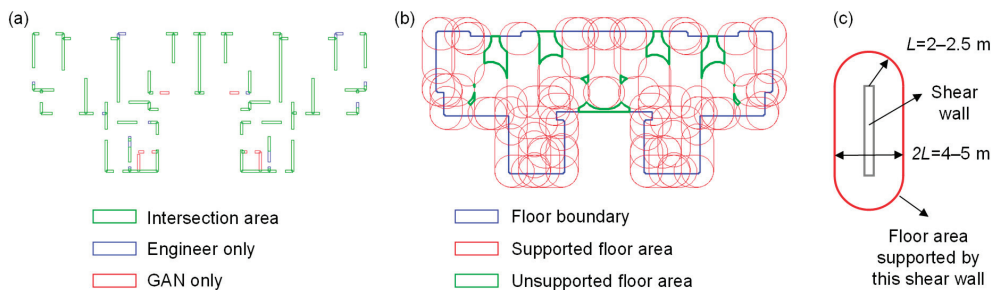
Evaluation method of shear wall layout: (a) planar layout consistency; (b) vertical load transferability; (c) floor area supported by a shear wall.
